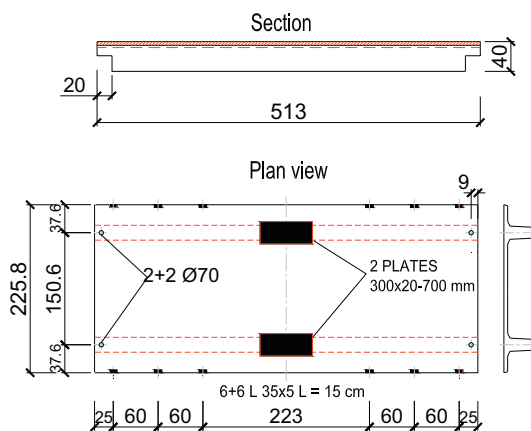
Cross section and dimensions of the double-tee slab elements used in the diaphragm of the second floor (dimensions in cm).
